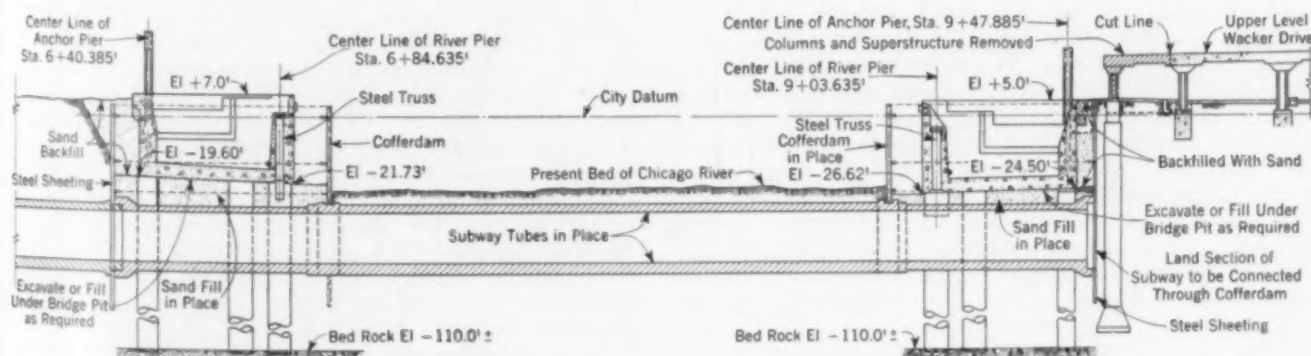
SECTIONAL ELEVATION OF FOUNDATION, NORTH STATE STREET BRIDGE
